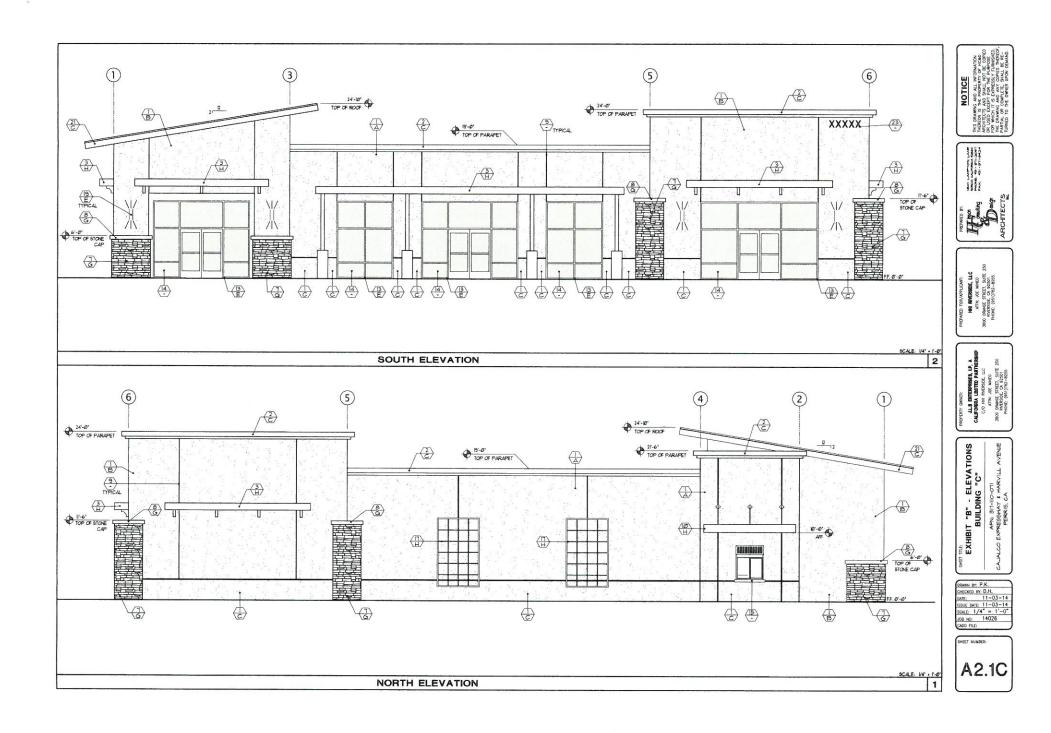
EXHIBIT "B" - ELEVATIONS BUILDING "C"
